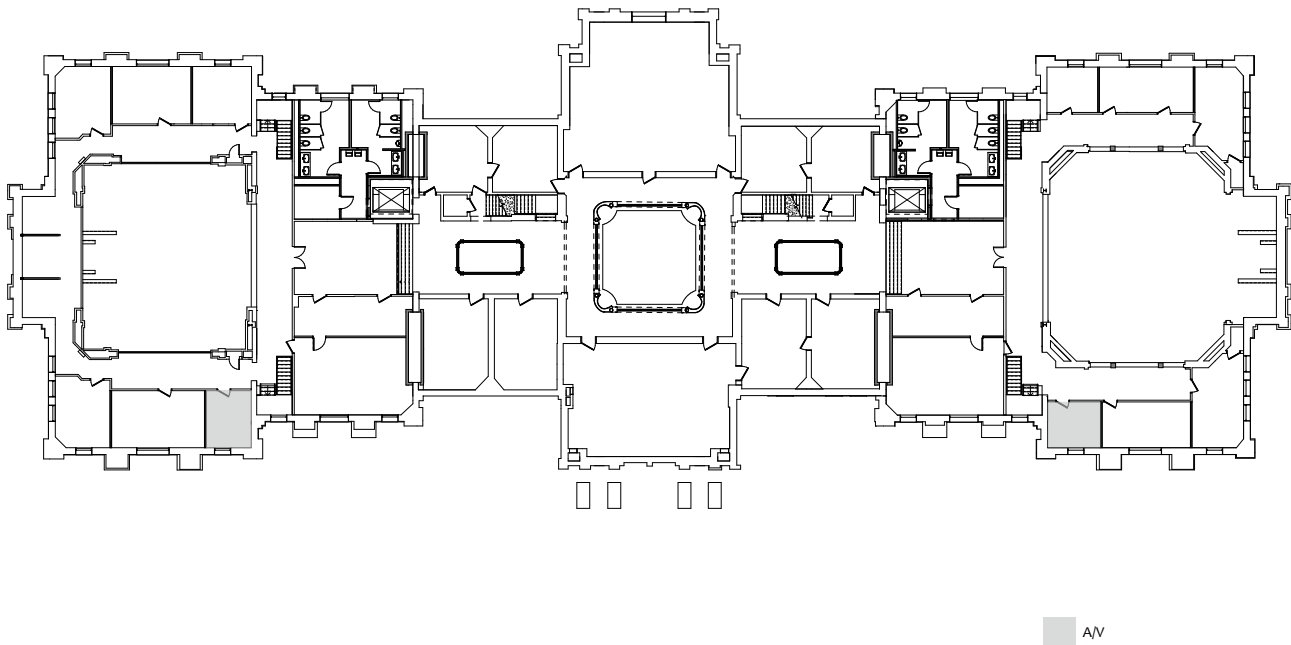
Support - A/V and Phone Rooms - Third Floor [Capitol]
